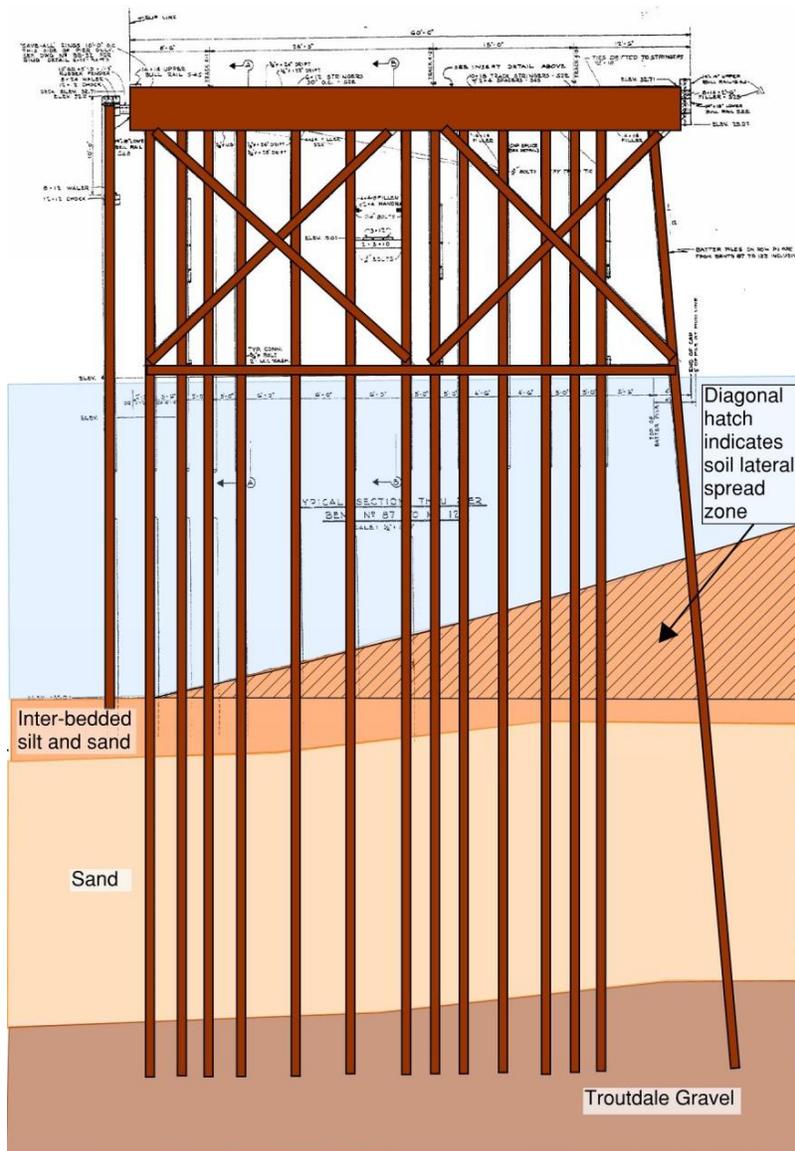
Berth 410 typical pier section indicating zone of soil lateral spreading
